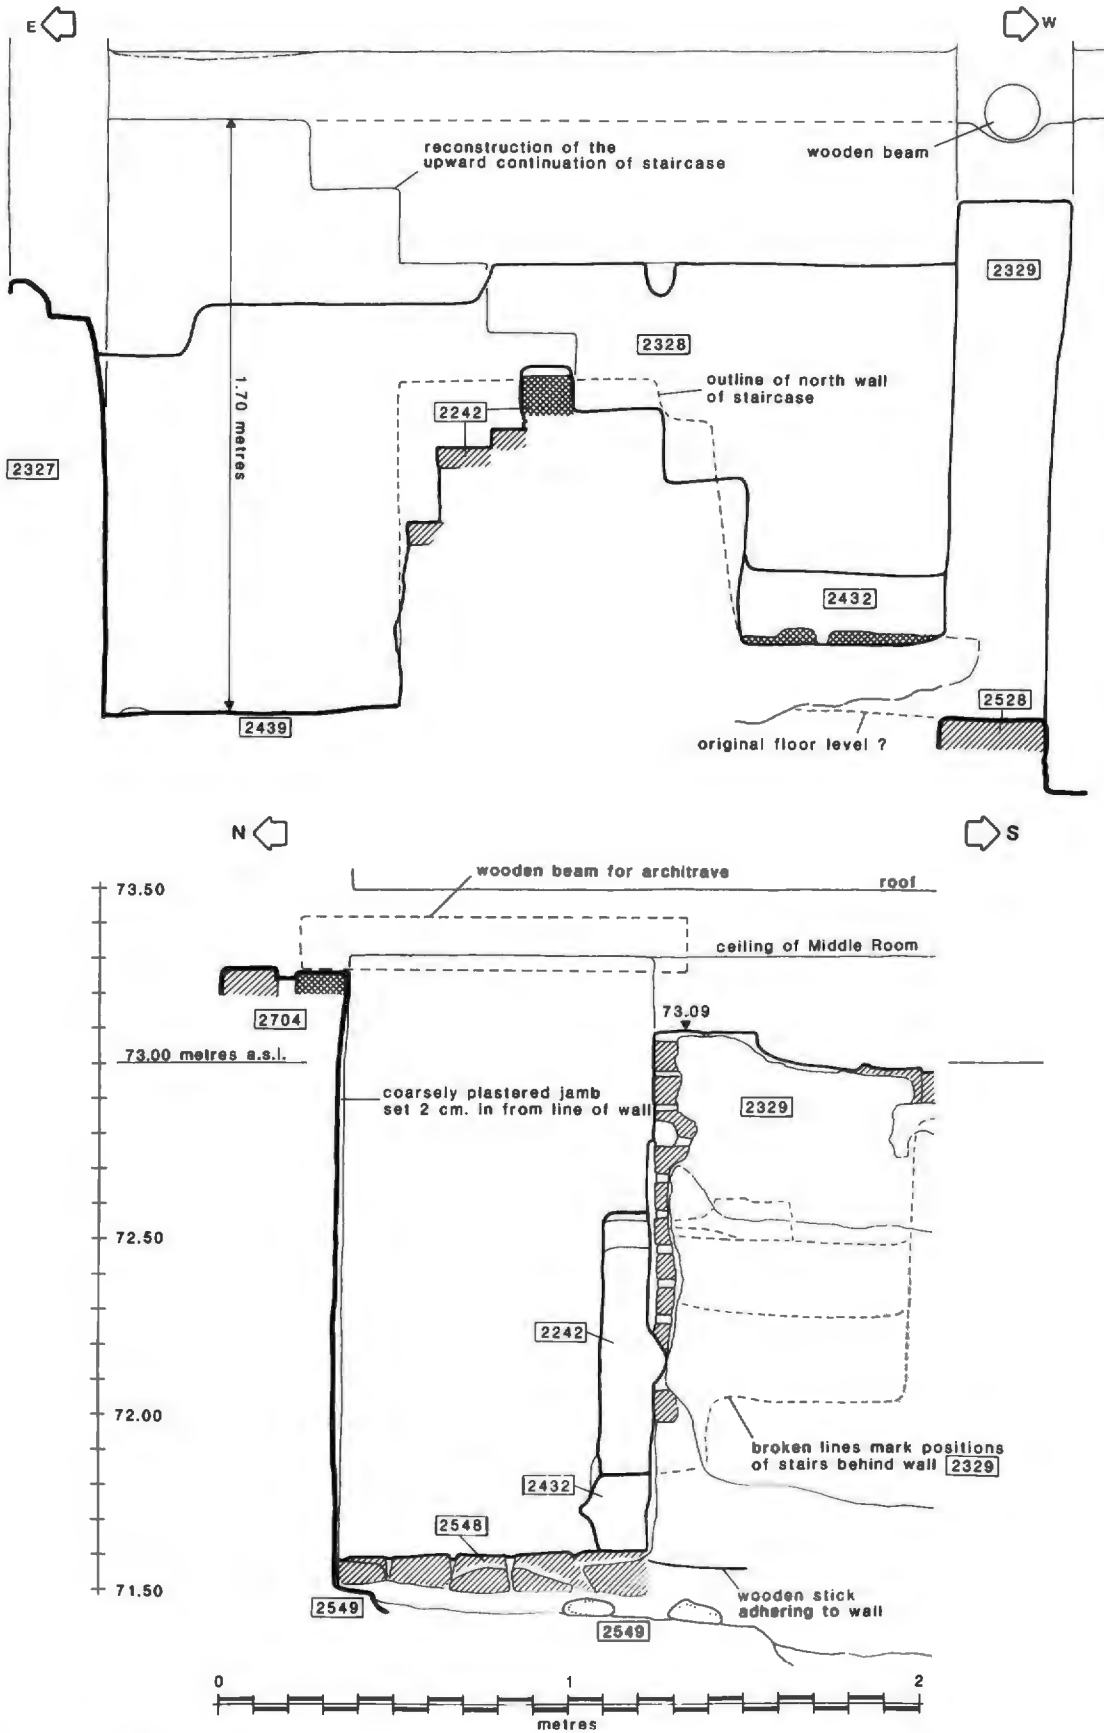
Elevations of the staircase of Gate Street 9 (originals by Angela Tooley).
